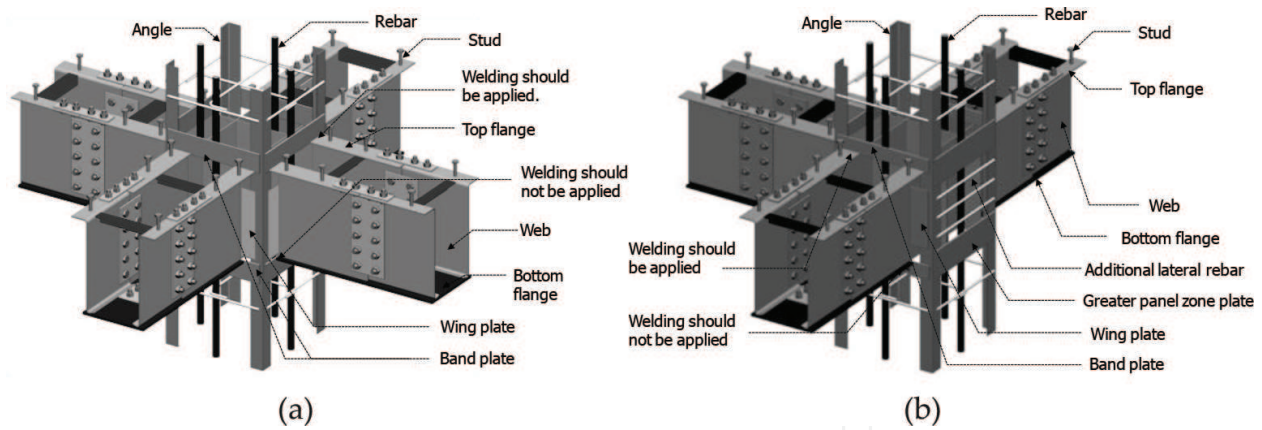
Beam-column joint details: (a) interior beam-column joint and (b) exterior beam-column joint.
